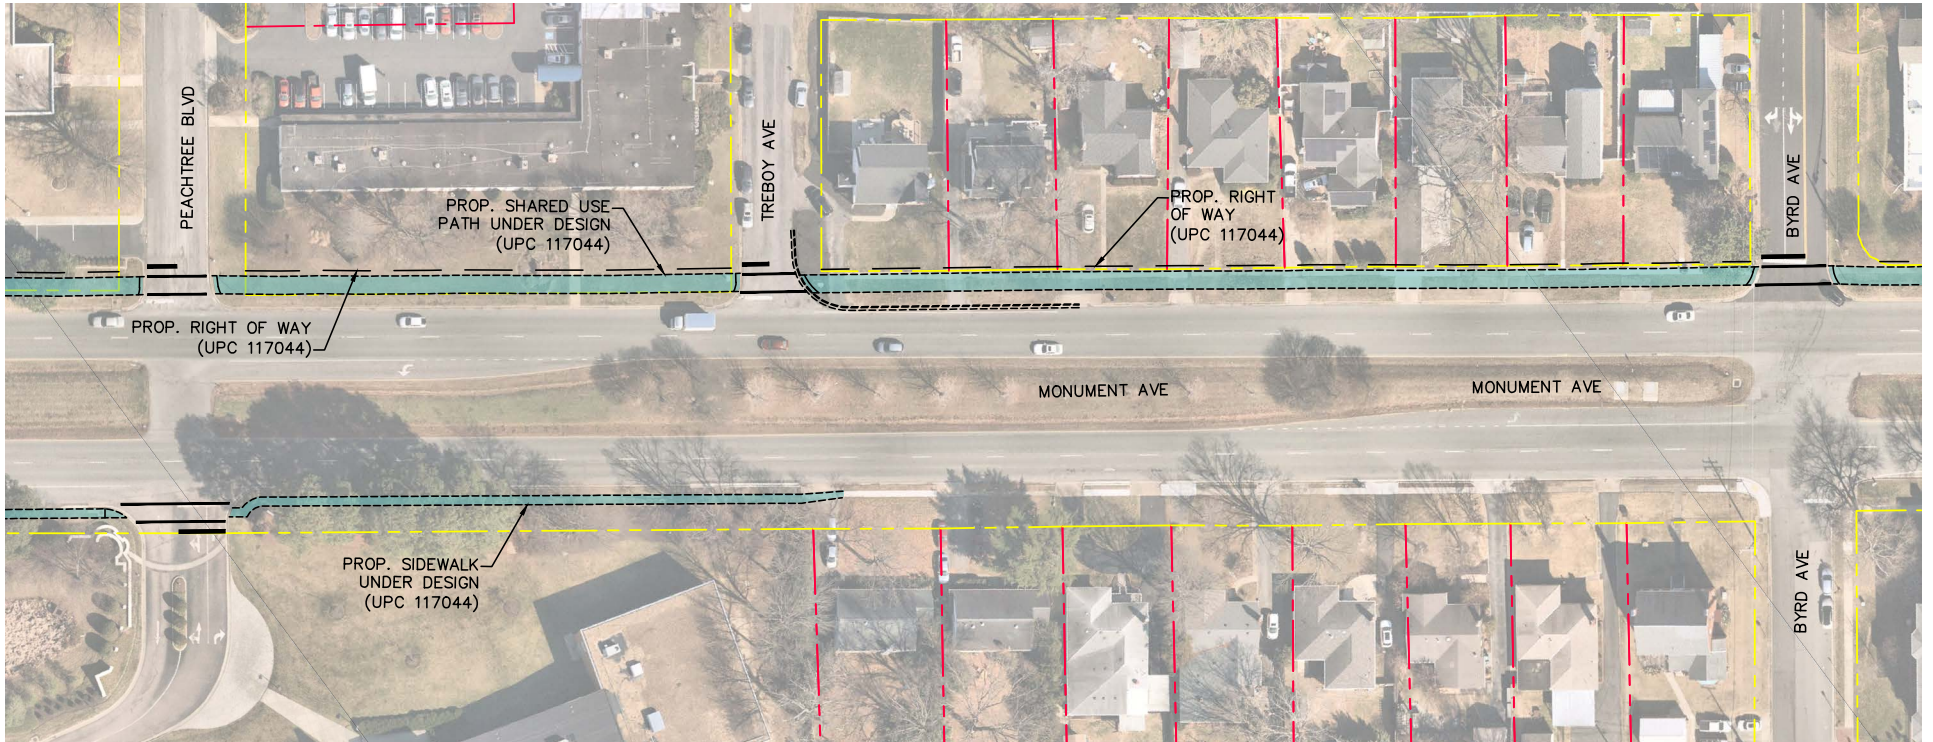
MONUMENT AVENUE – SIDEWALK CONCEPT
